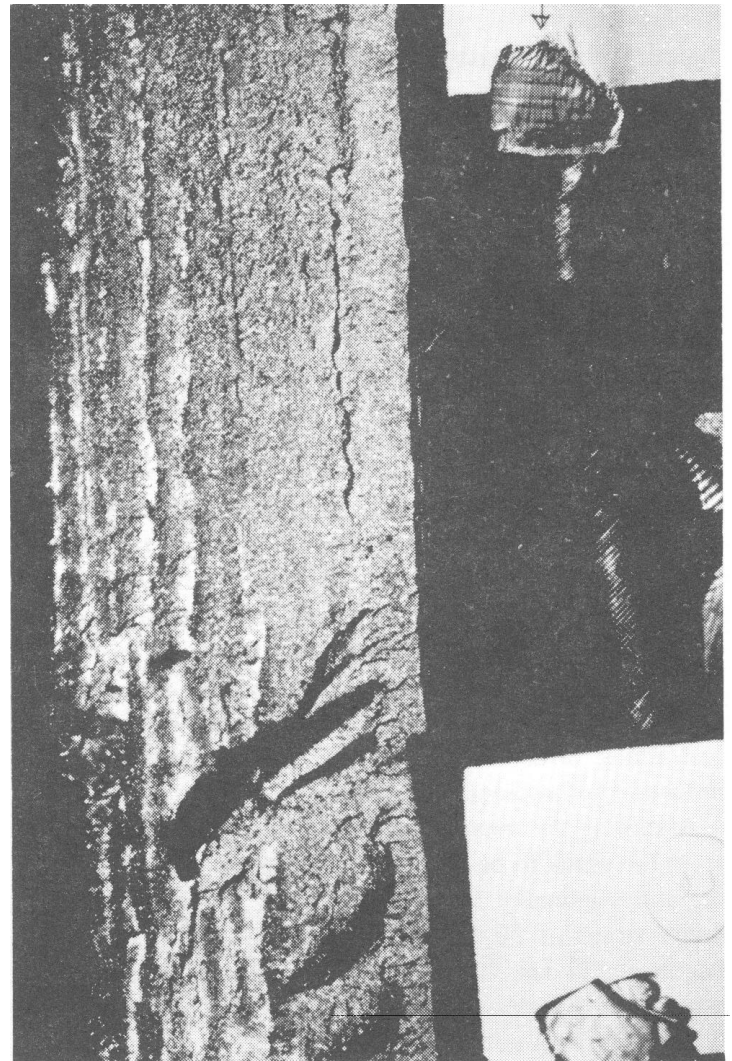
Failure surface of partial penetration welded splice—center of bottom flange.
